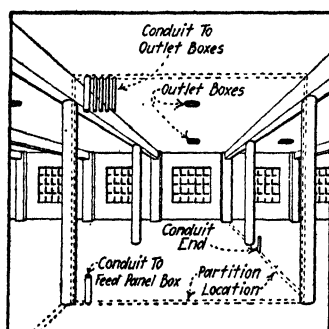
Showing appearance of conduit in a concrete building after floors and columns are poured. Note the importance of accurately determining the partition locations.
